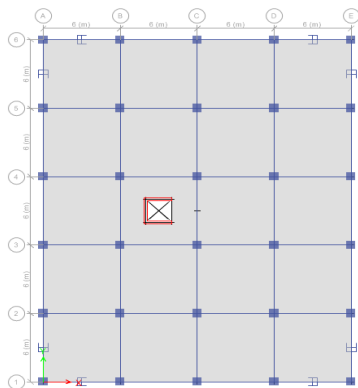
RCC building with corner Fluid Viscous Dampers for bottom 3 storey's plan view.
